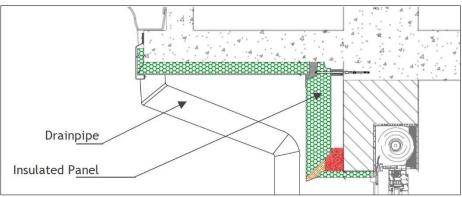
Drainpipe integration [drawing created using AutoCAD]
